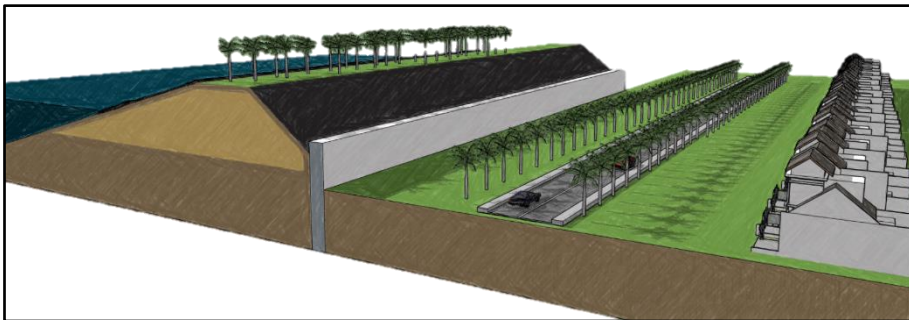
IMPRESSIONS DRAWING COASTAL DIKE
